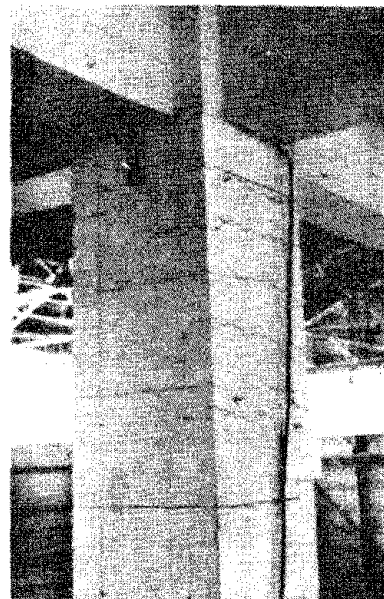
Crack Behavior of the Top of Column at 3rd Floor
